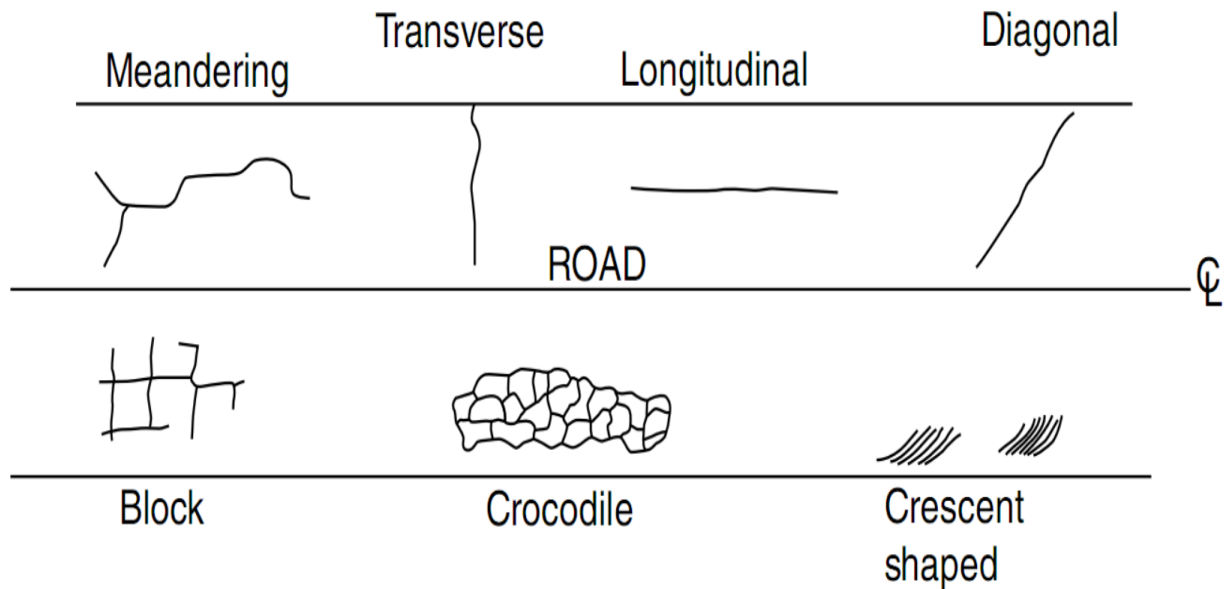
Sketch of common types of cracks in flexible pavements (Source: Austroads, 1991).
